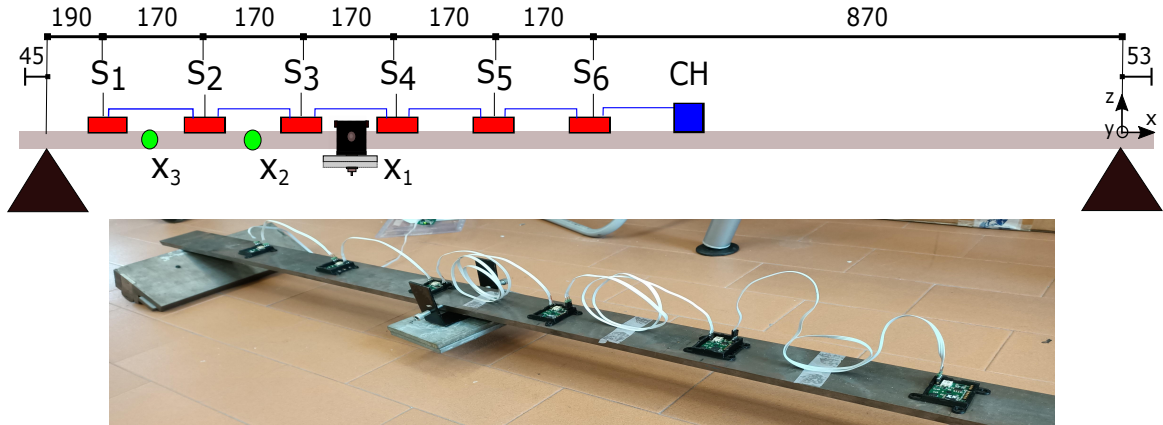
Experimental setup for MRak-CS testing purposes: sensor installation plan (all dimensions in millimeters) inclusive of the damaging mechanism and positions. [©2021 IEEE]
